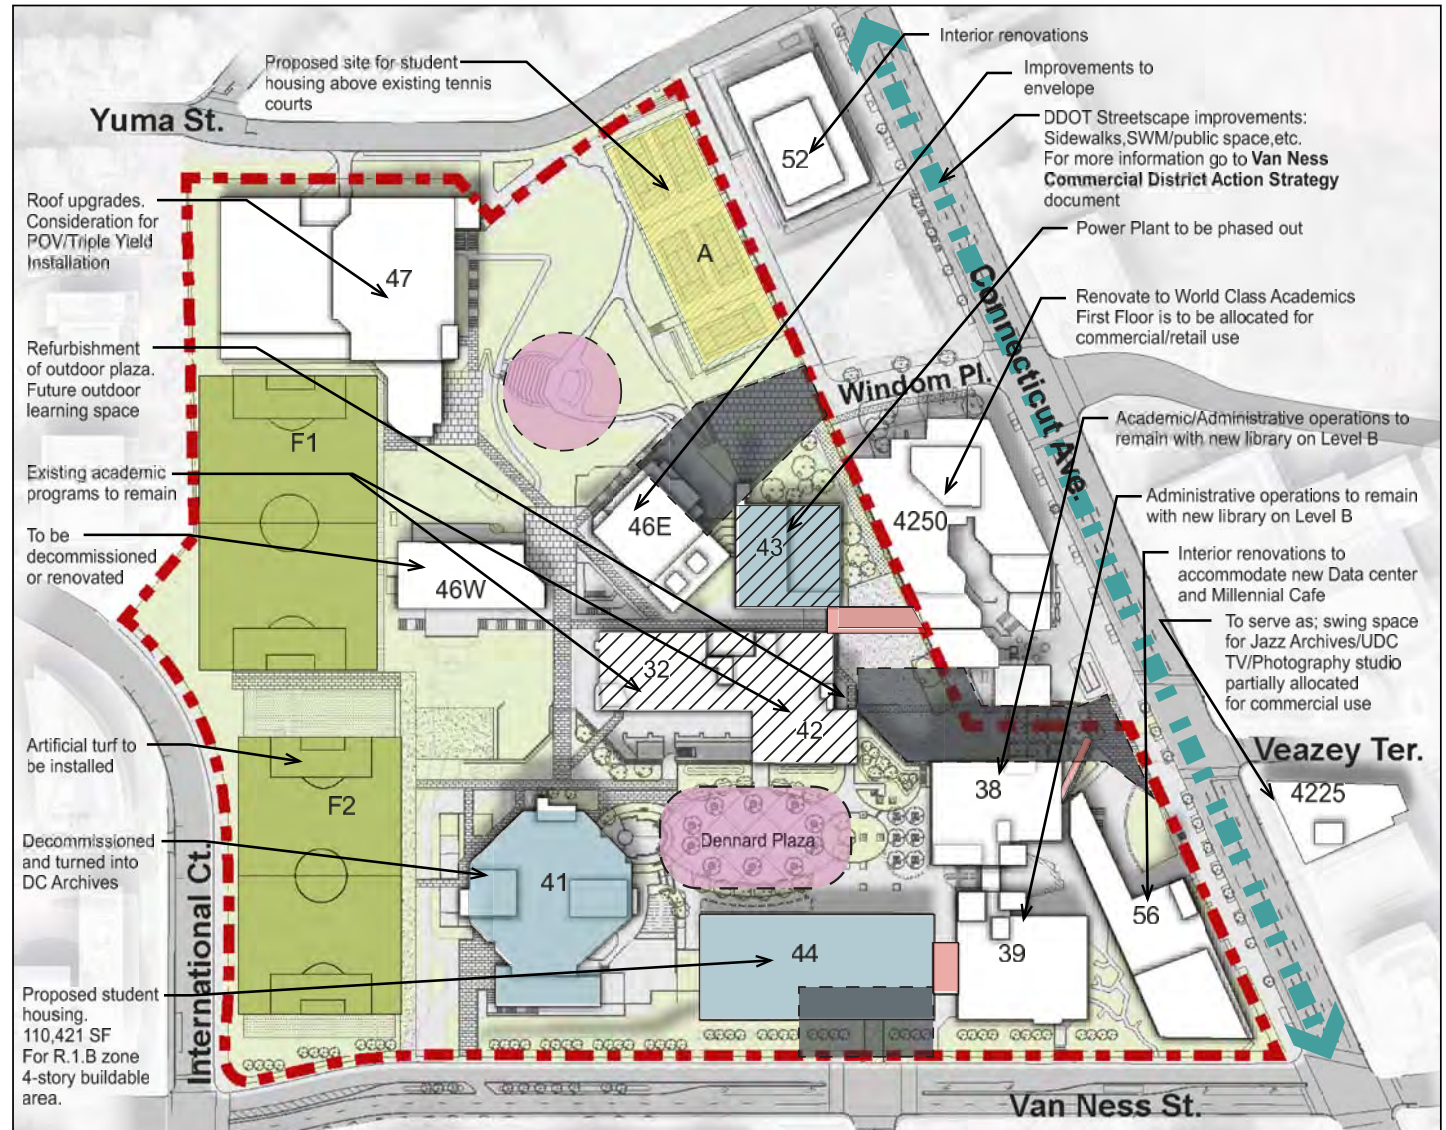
B PROPOSED CAMPUS DEVELOPMENT PLAN
